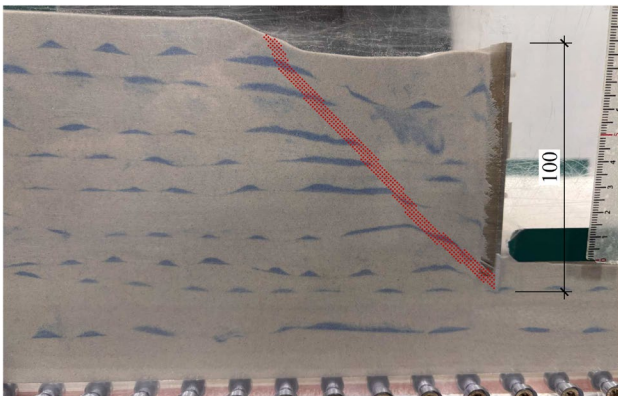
Soil nail wall with prestressed anchors in the second row at failure; thick line in red corresponds to the interpreted shear band
